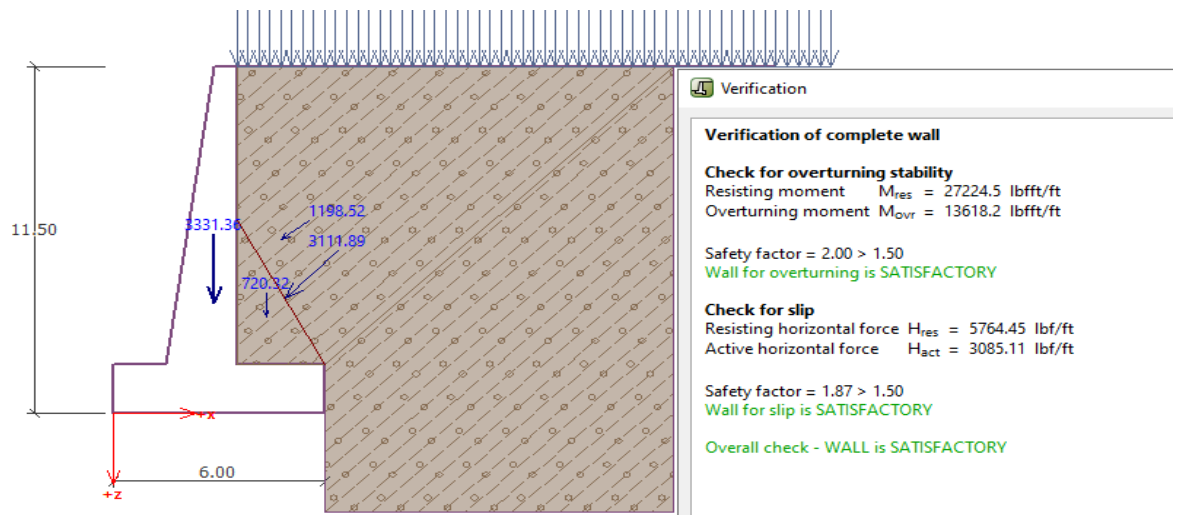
X-section view of Cantilever Retaining wall from GEO-5
